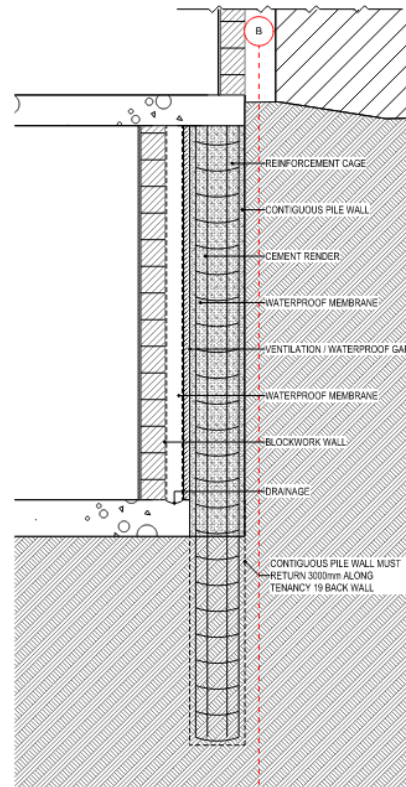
proposed contiguous pipe wall on the southern boundary (source: EJE Architects, 01/12/2023)
